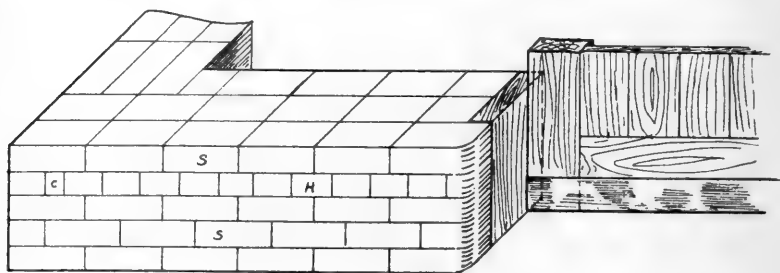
A 14 inch thick wall in Garden bond showing a hinged door with frame in check and a square external angle to the wall.
